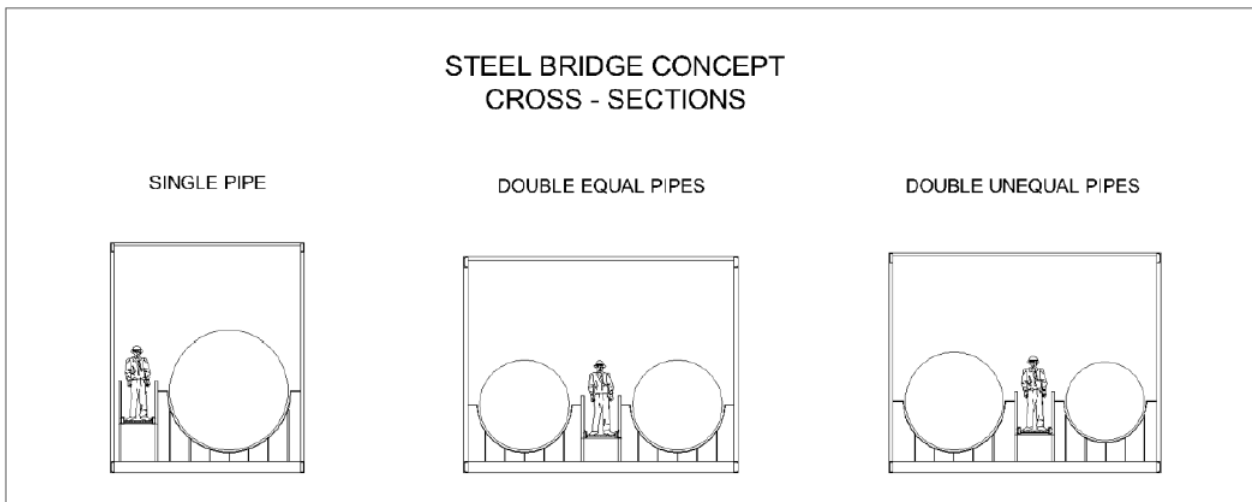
Cross Sections through Conventional Steel Pipe Bridge
